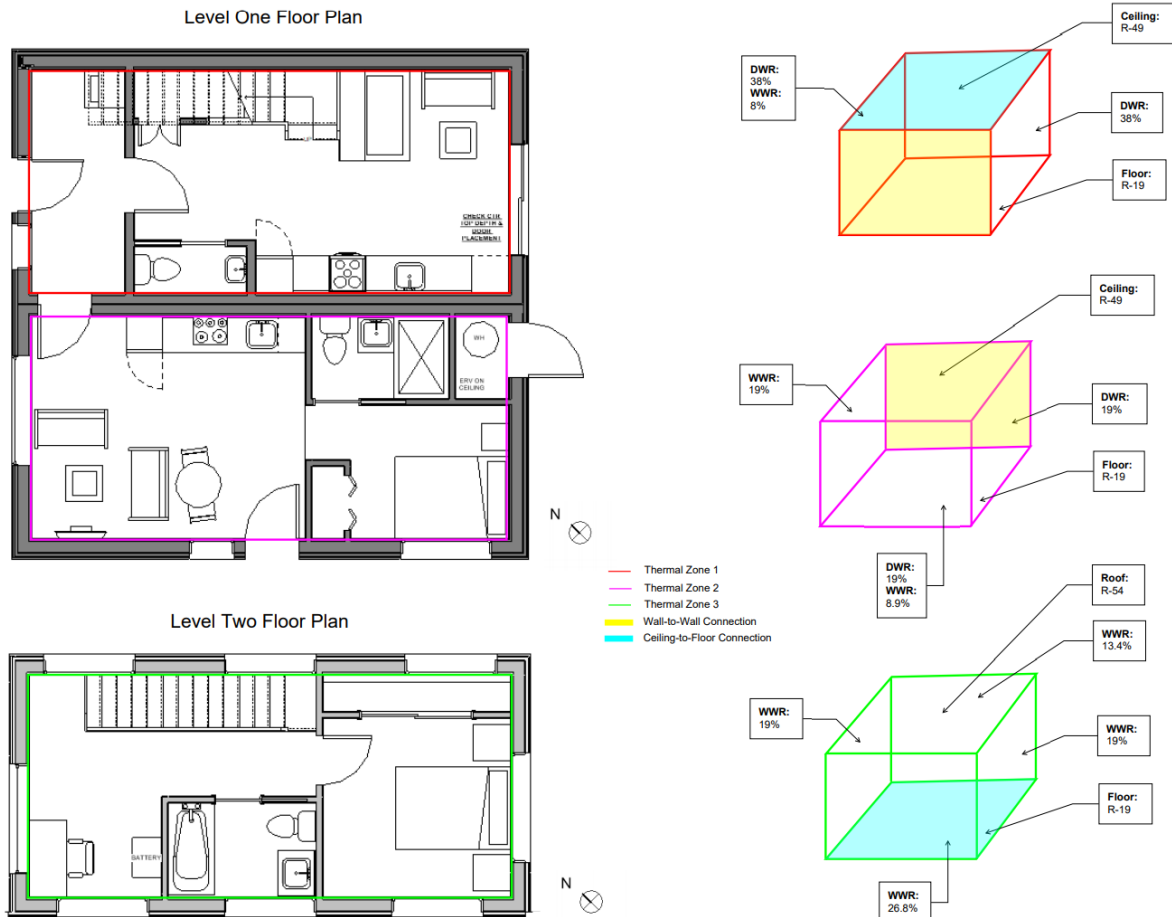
Thermal zone schematic (The mud room, common main and ADU entry, was eliminated and main kitchen and half bath moved in as-built house. Initial plan attempted to keep all services on the demising wall near the mechanical room.)
